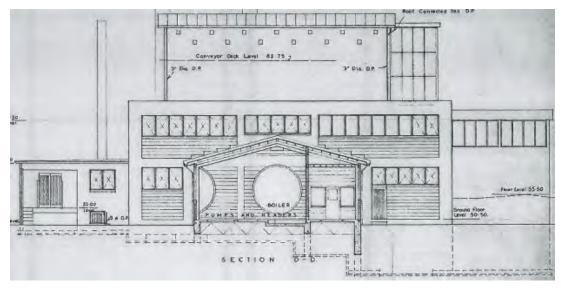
Building Section – Through Plantroom, Boiler House beyond
